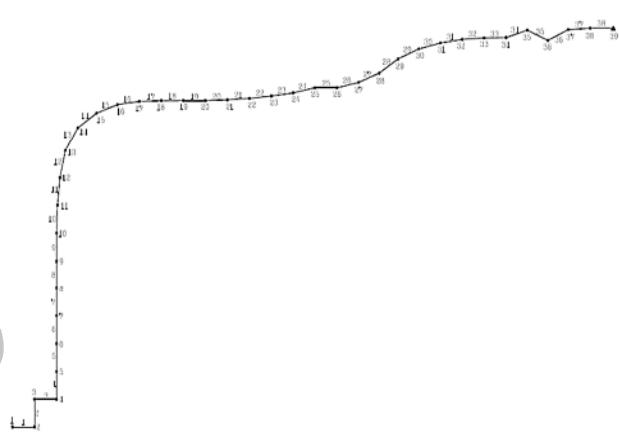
The sewer network layout in Isfahan's Mirzakooch Khan boulevard
